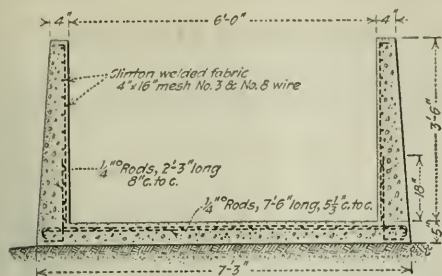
TYPICAL FLUME SECTION WITH STANDARD REINFORCING
